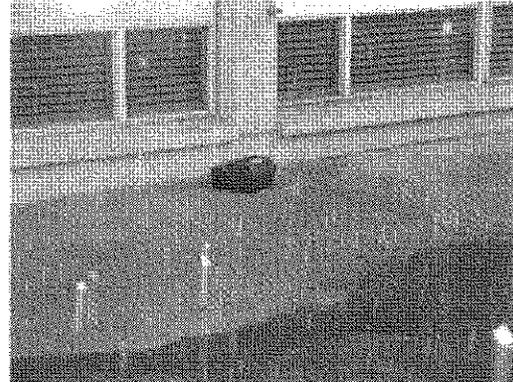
Exterior concrete walls atop foundation (Section 6.2)
